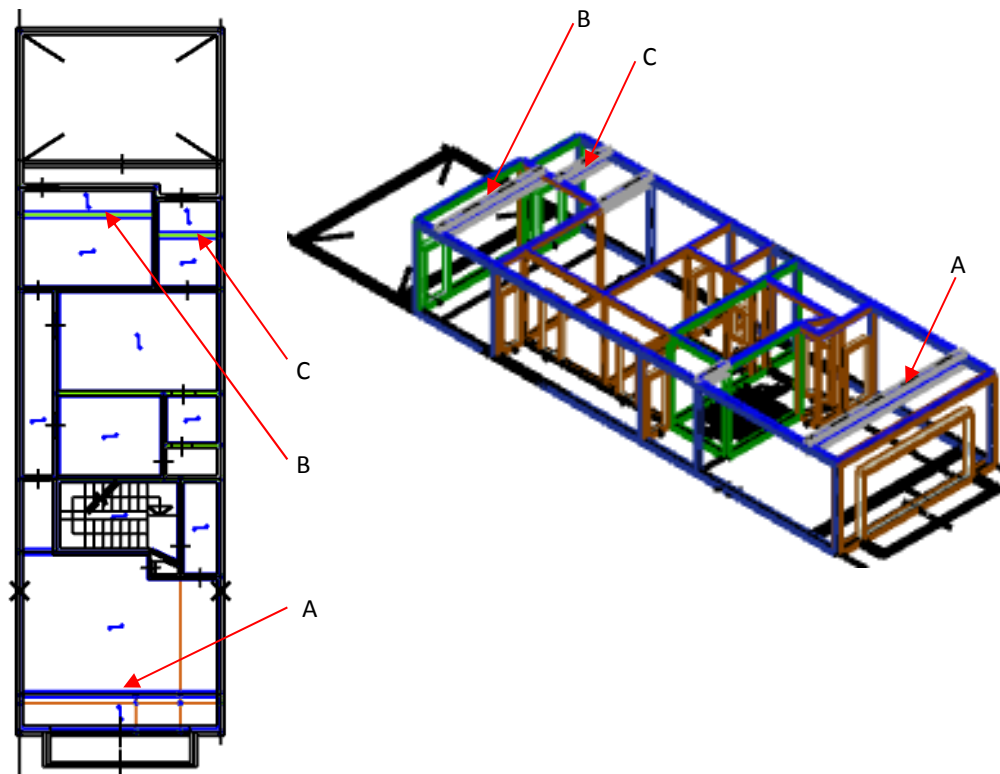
Plan and 3-dimensional view of typical floor level in 3Muri® control numerical model with additional beams (A, B and C) specified for support of area of slab with additional loads from balcony or room projecting on façade indicated.
